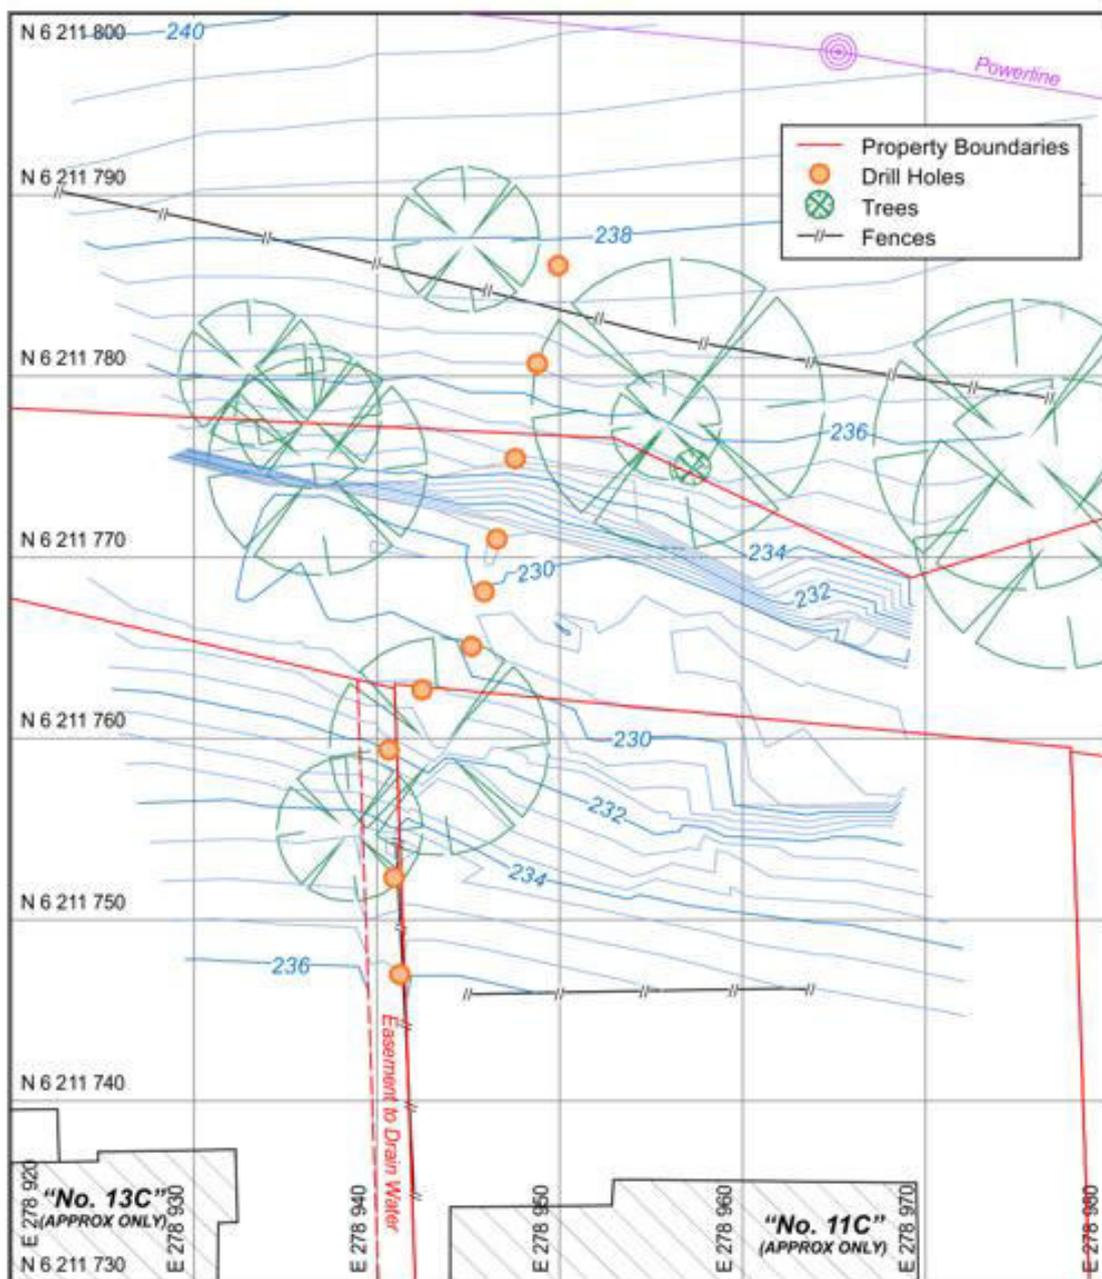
Myrtle Creek Site 23 – rock bar and proposed drill holes
